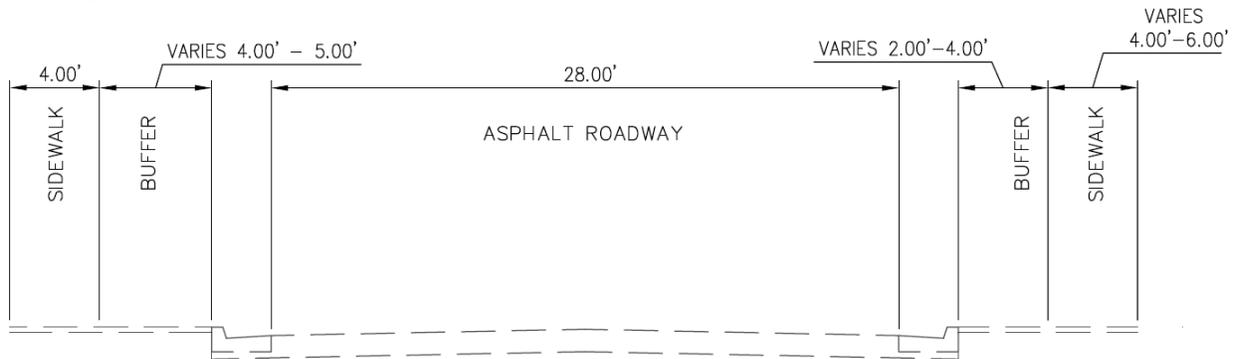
Existing Typical Section Blue Ribbon Road Looking East
